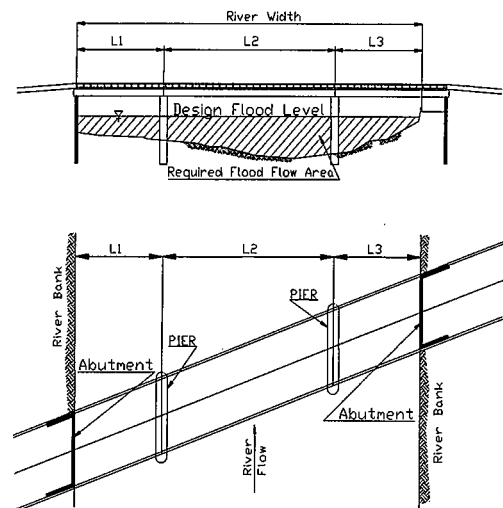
Location of Abutment and Pier in the River Channel
